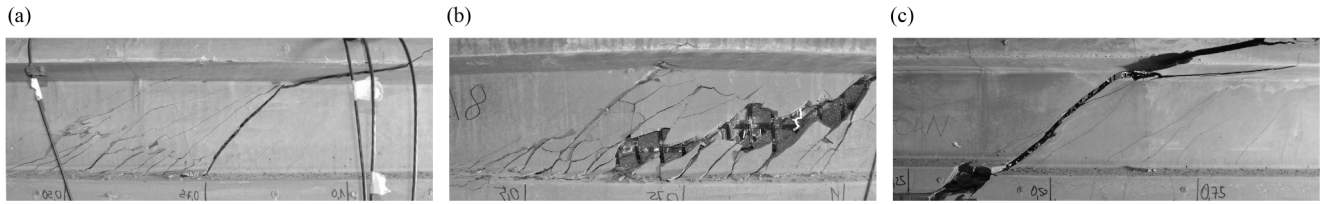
Crack pattern at failure for TRC specimen: (a) reinforced with ASA-impregnated textile; (b) reinforced with epoxy impregnated textile; (c) reinforced with ASA-impregnated textile and prestressed CFRP rods [30].
